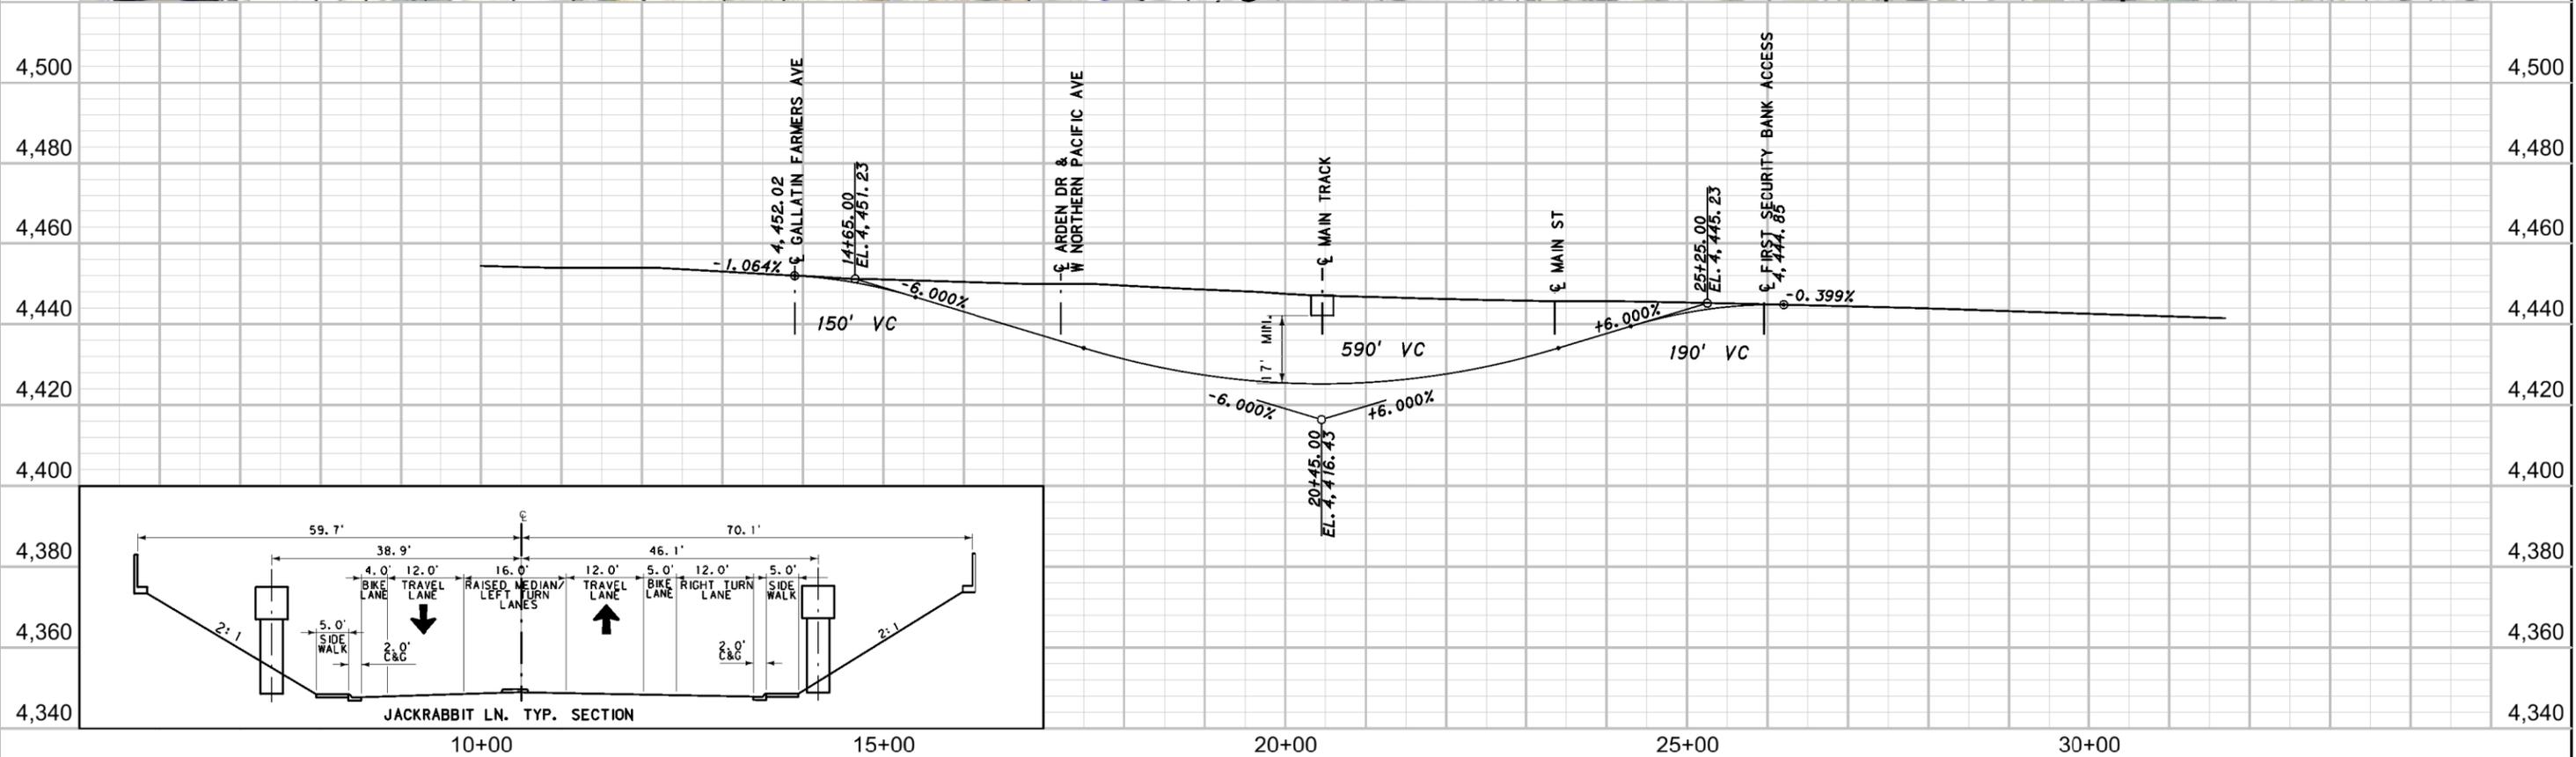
Jackrabbit Lane Underpass Conceptual Plan and Profile
